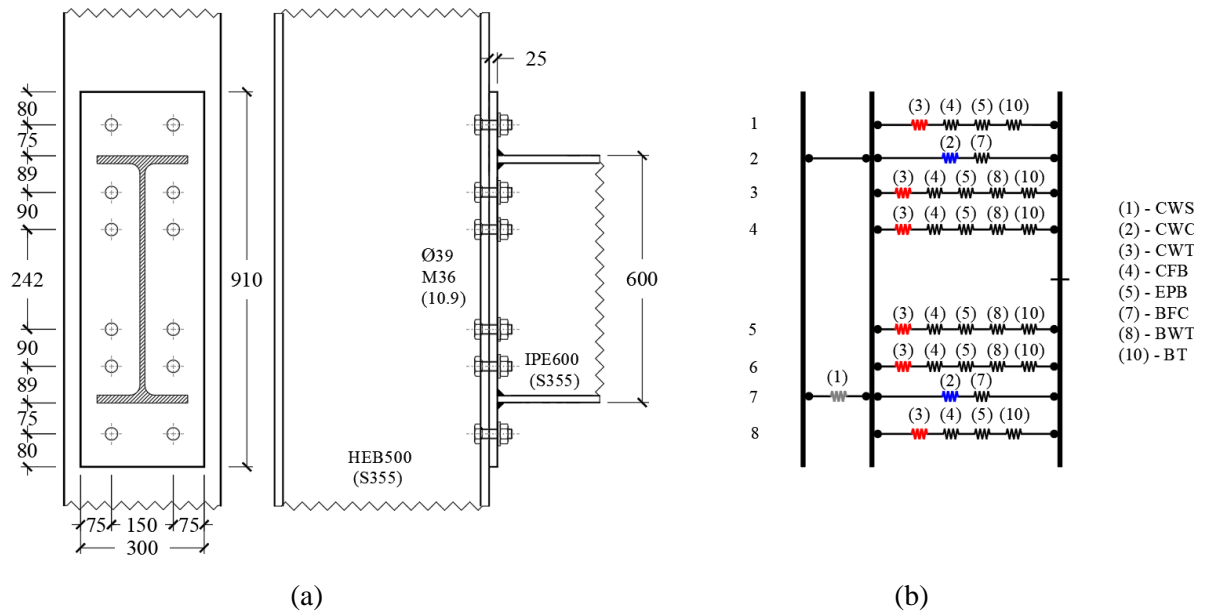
Joint E3-TB-E-M3_ts0: (a) geometrical sketch of the joint and (b) model assembly (Augusto *et al.*, 2016; Augusto, 2017).
